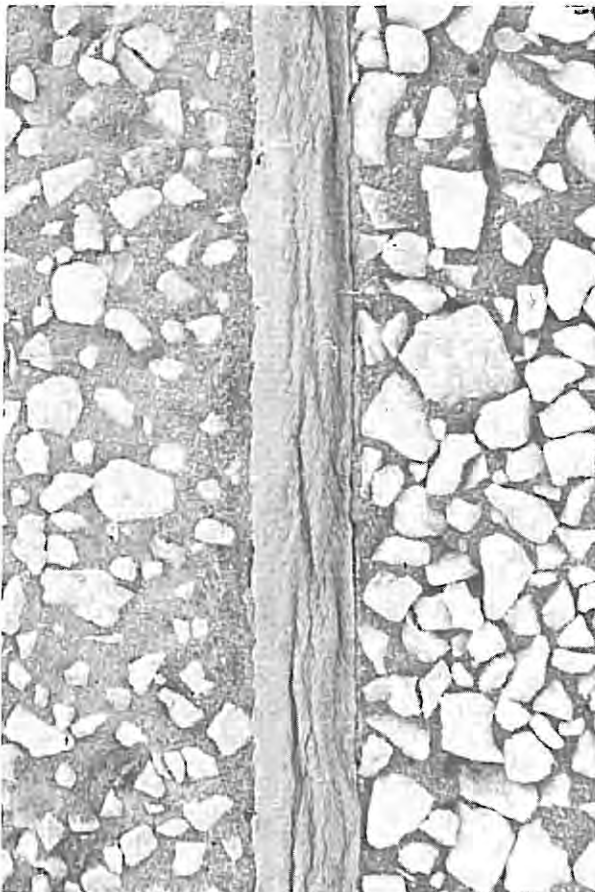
Vertical joint between concrete panels with typically wrinkled skin-forming plastic sealant
